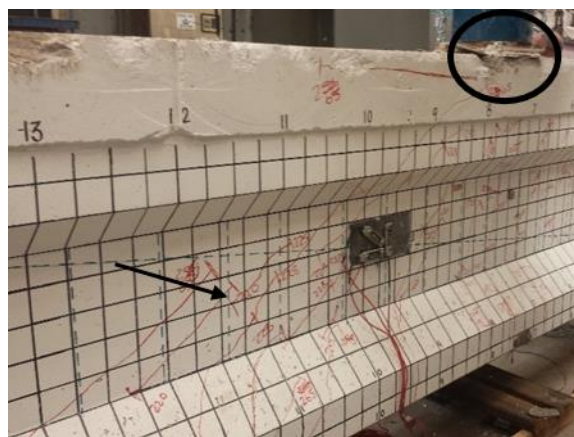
Cracking and failure patterns for shear test A1 at failure inclined shear cracks are identified using a black arrow and crushing of the deck concrete at the extreme compression fiber is highlighted with a black circle
